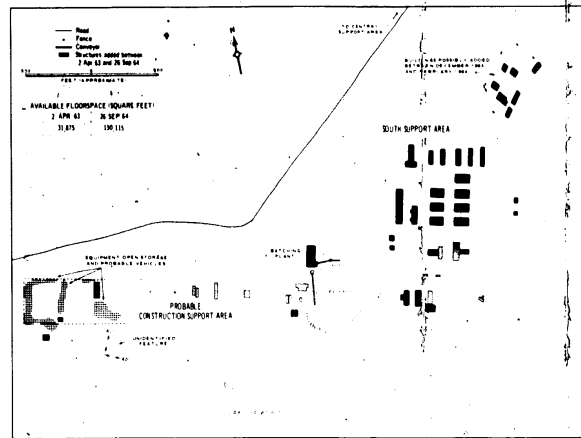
SOUTH SUPPORT AREA AT SITE 13, SSATC
